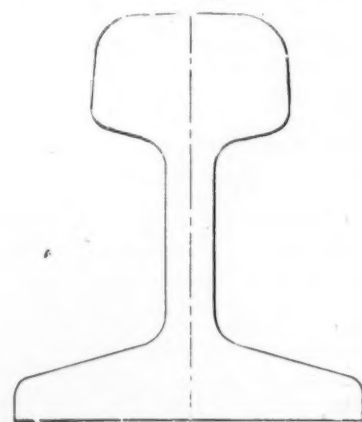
Suggested Section.—Area of Top Section, 4.75 sq. in. Bottom Section, 4.6 sq. in. Area of Whole Section, 11.3 sq. in. Weight Per Yard, 115.5 lb.
